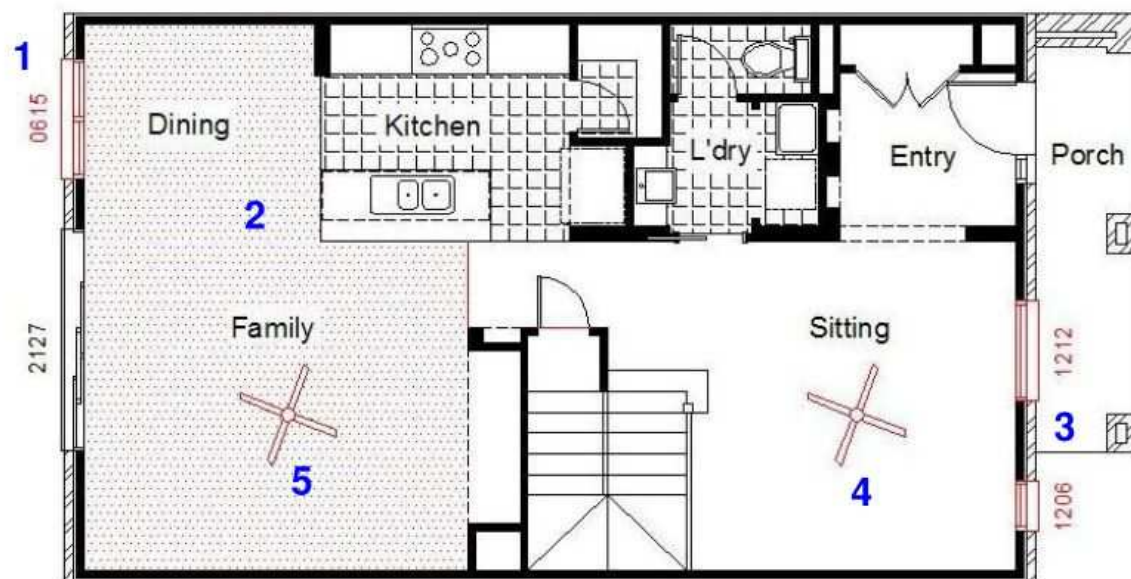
Redesigned ground floor plan for Dwelling 16 in Brisbane.
